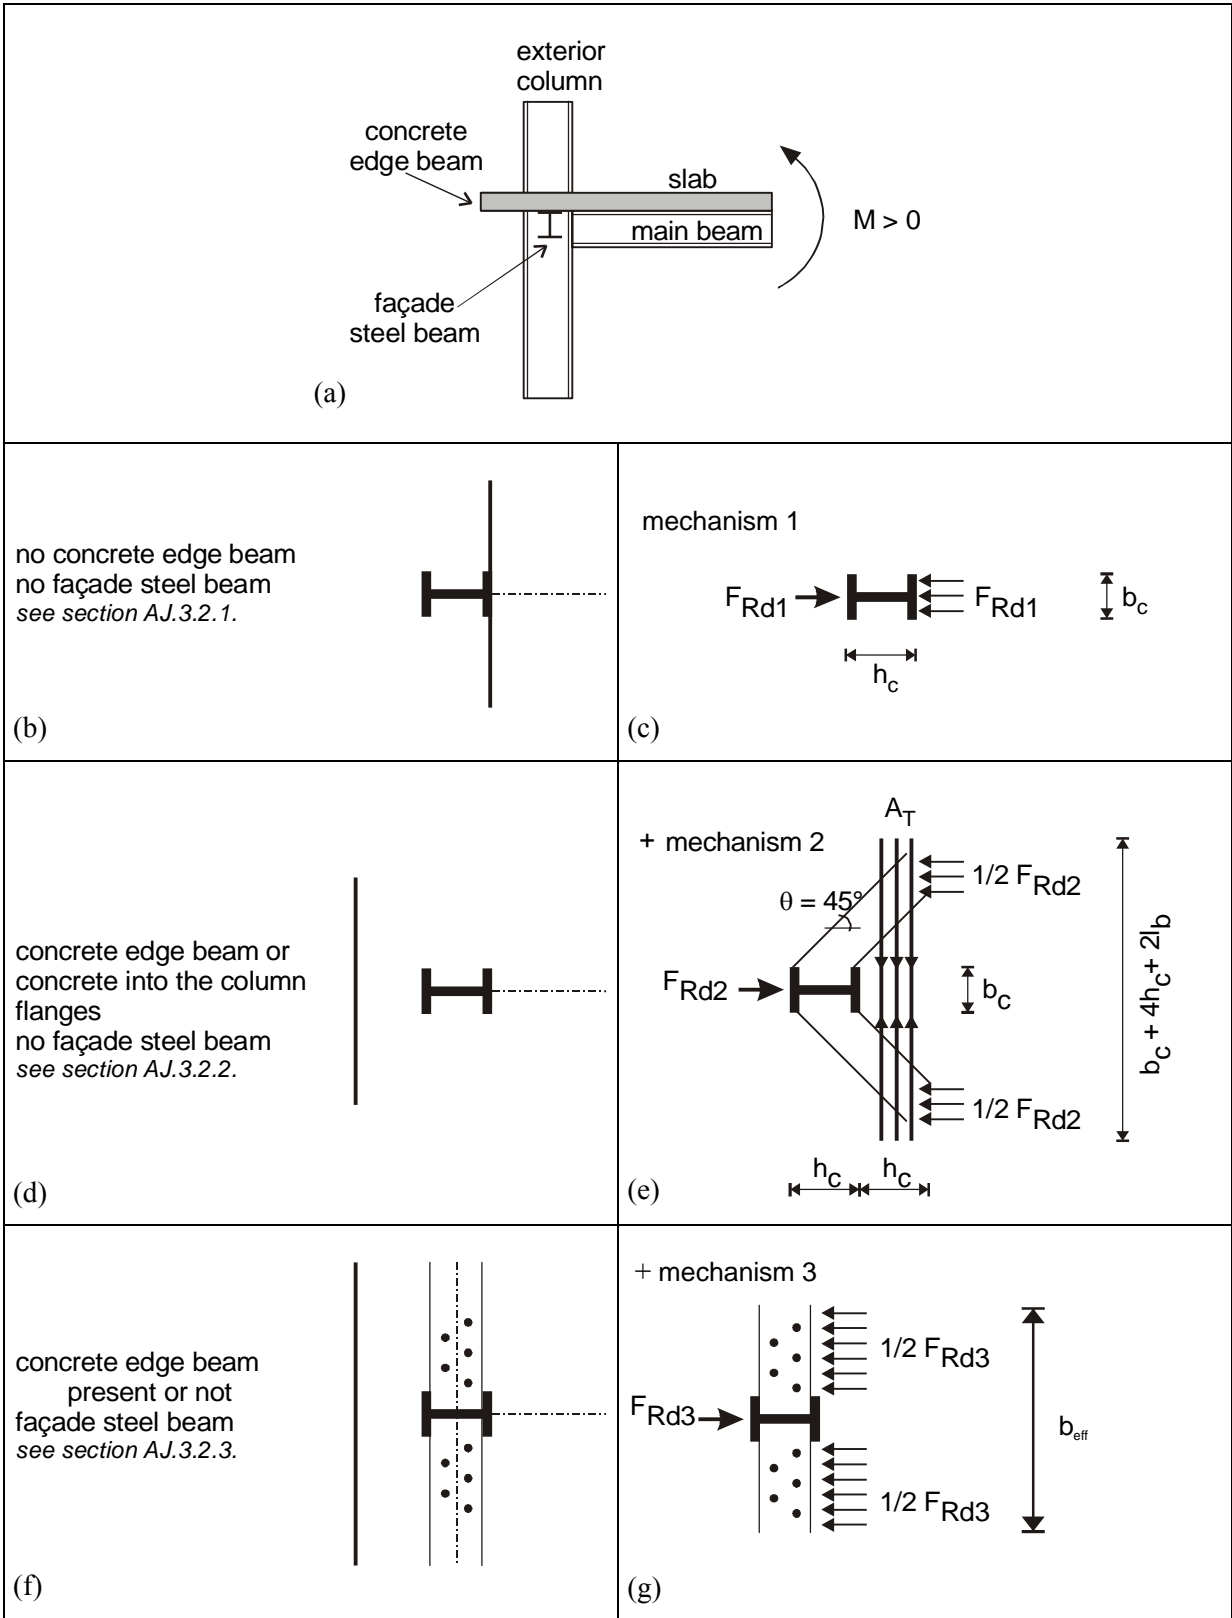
Configurations of exterior composite beam-to-column nodes under positive bending moment in direction perpendicular to façade and possible transfer of slab forces.
